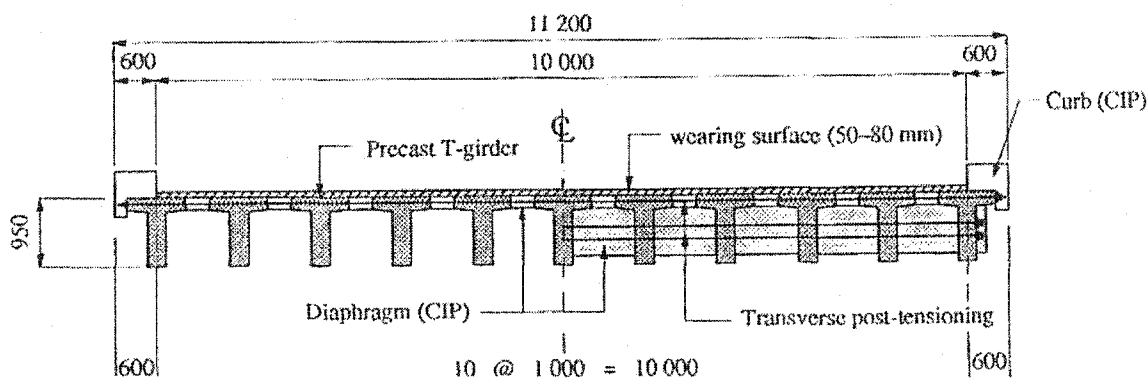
⁷: Cross Section of T Girder Bridges used for short spans in Japan
